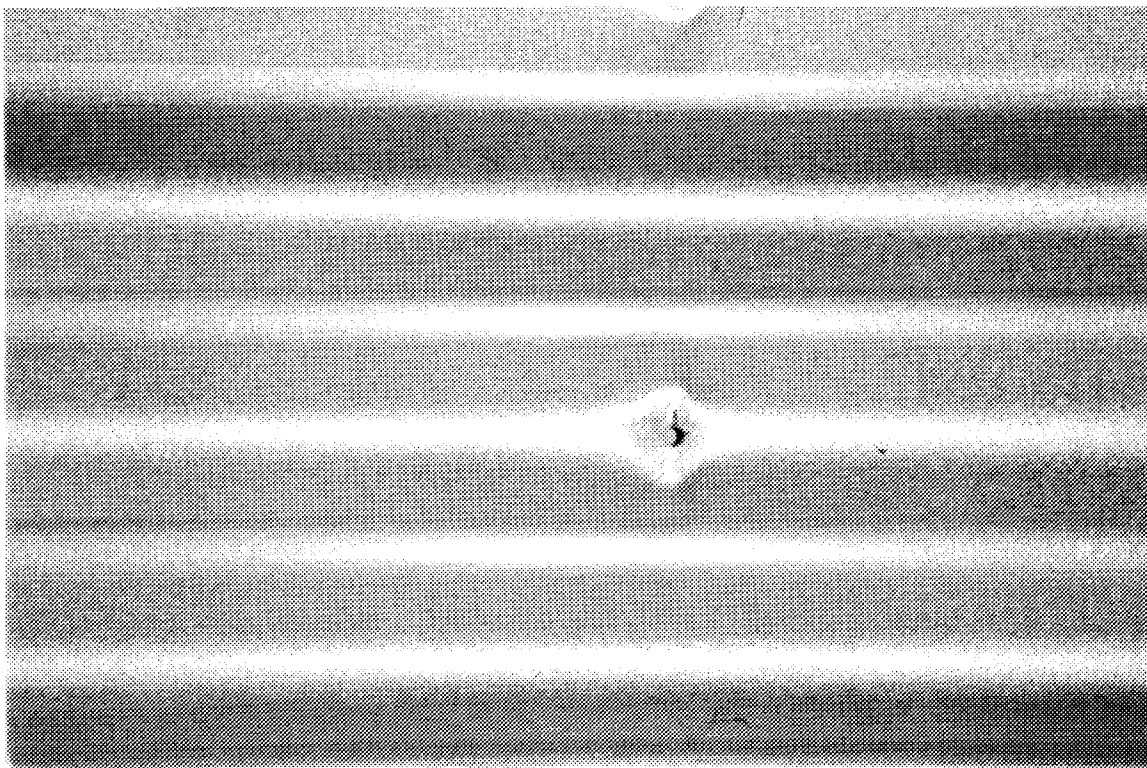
LOCAL PLASTIC DEFORMATION OF ARC-TANGENT TYPE ROOFING SHEET
